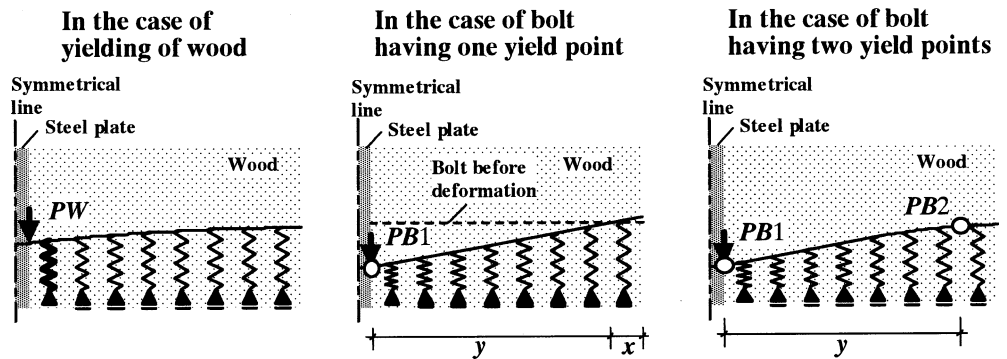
Yield conditions of wood and bolt in bolted joints with slotted-in steel plate
